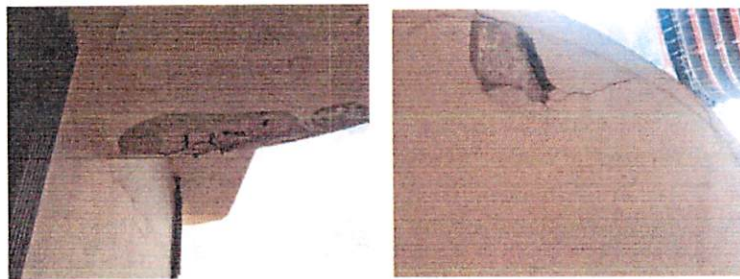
Figure C: Concrete spall at balcony slab edge in units 1008 & 211
